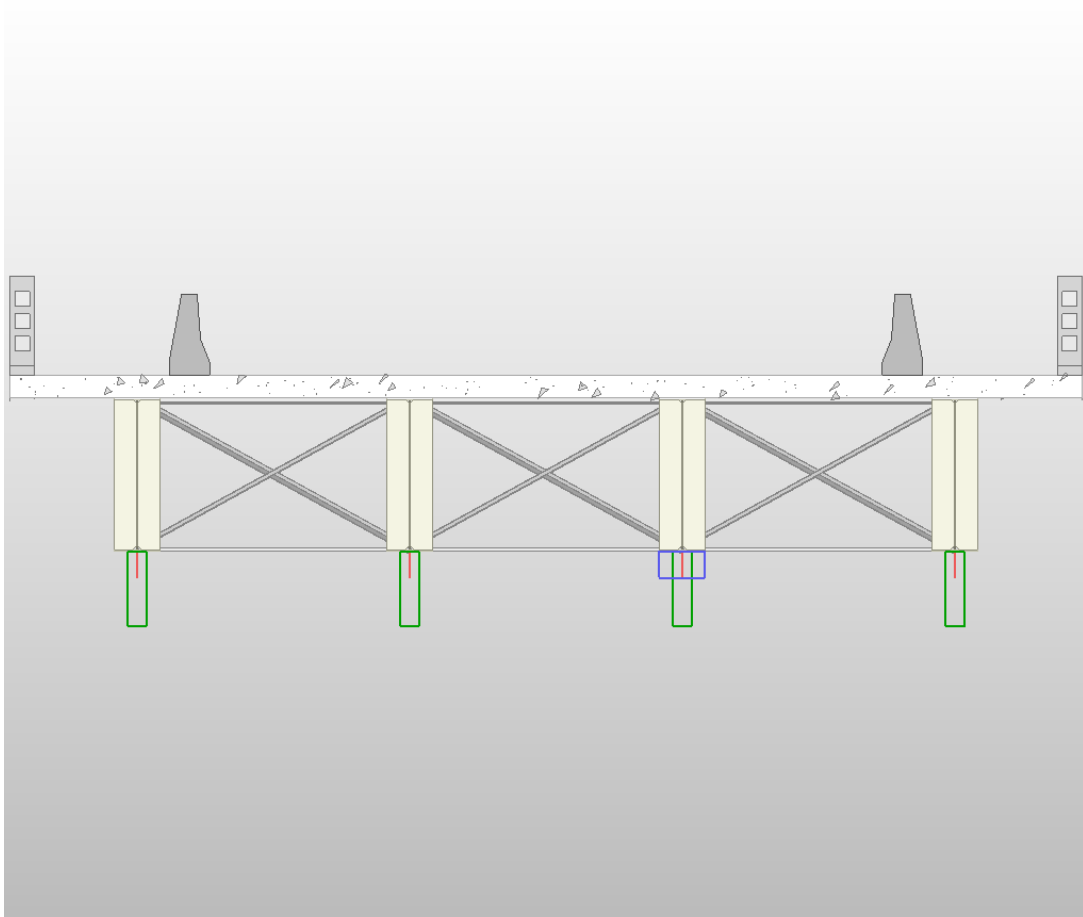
Typical Cross-Section (with girder, deck, barriers, footpath)
